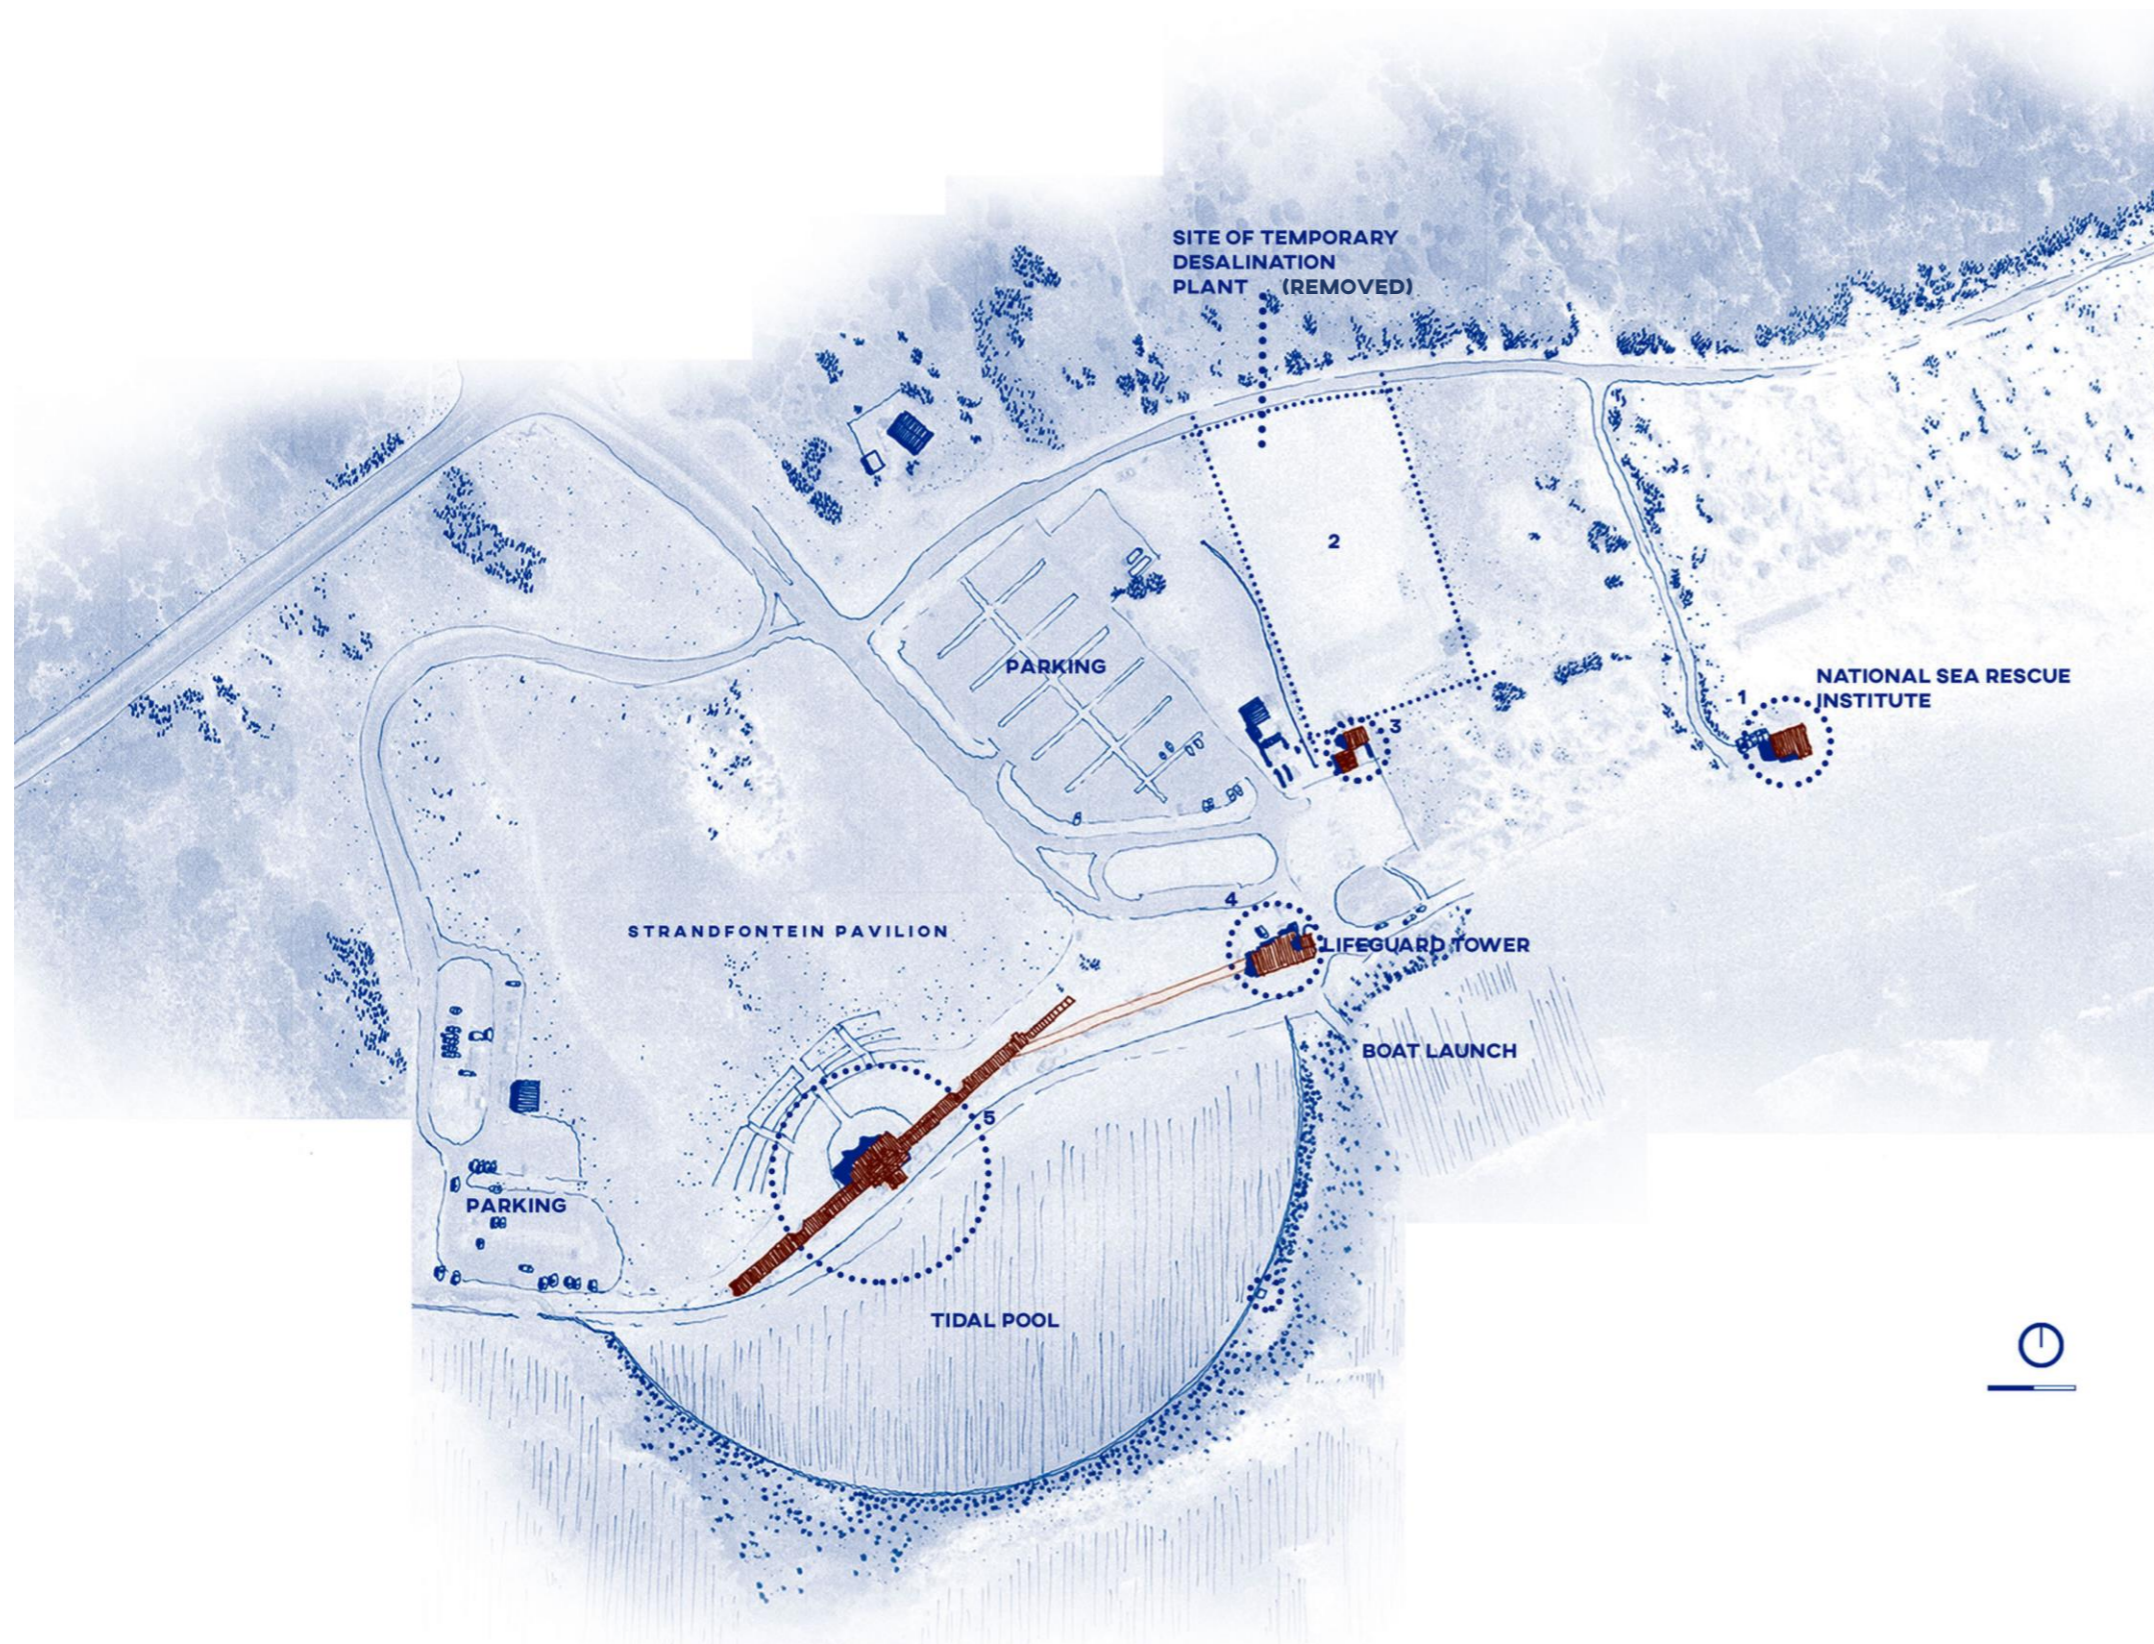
Existing Strandfontein Pavilion.(Source: Author's own)
